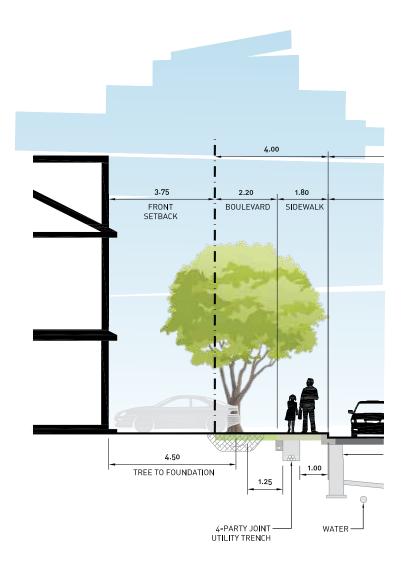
16.5m Local Road with Curb-Face Sidewalk
